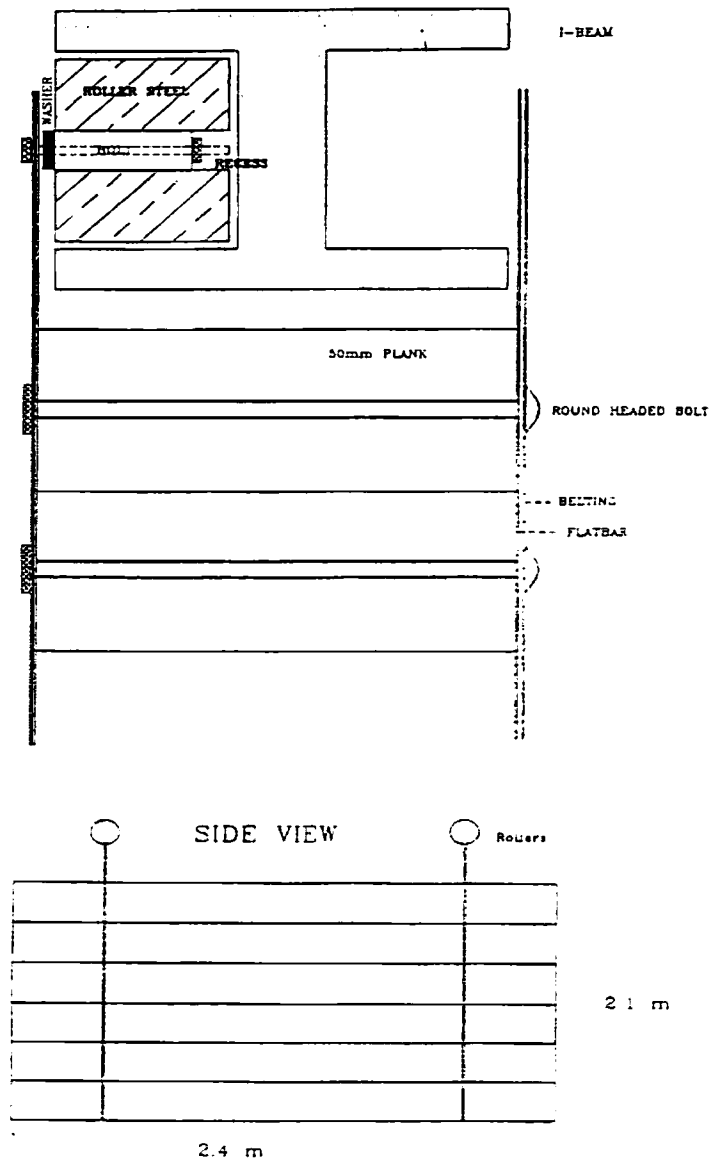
Sliding door mechanism with I-beam and rollers.
